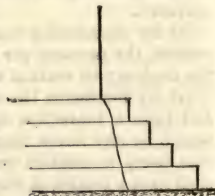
Crack in Footing from Excessive Offsets
